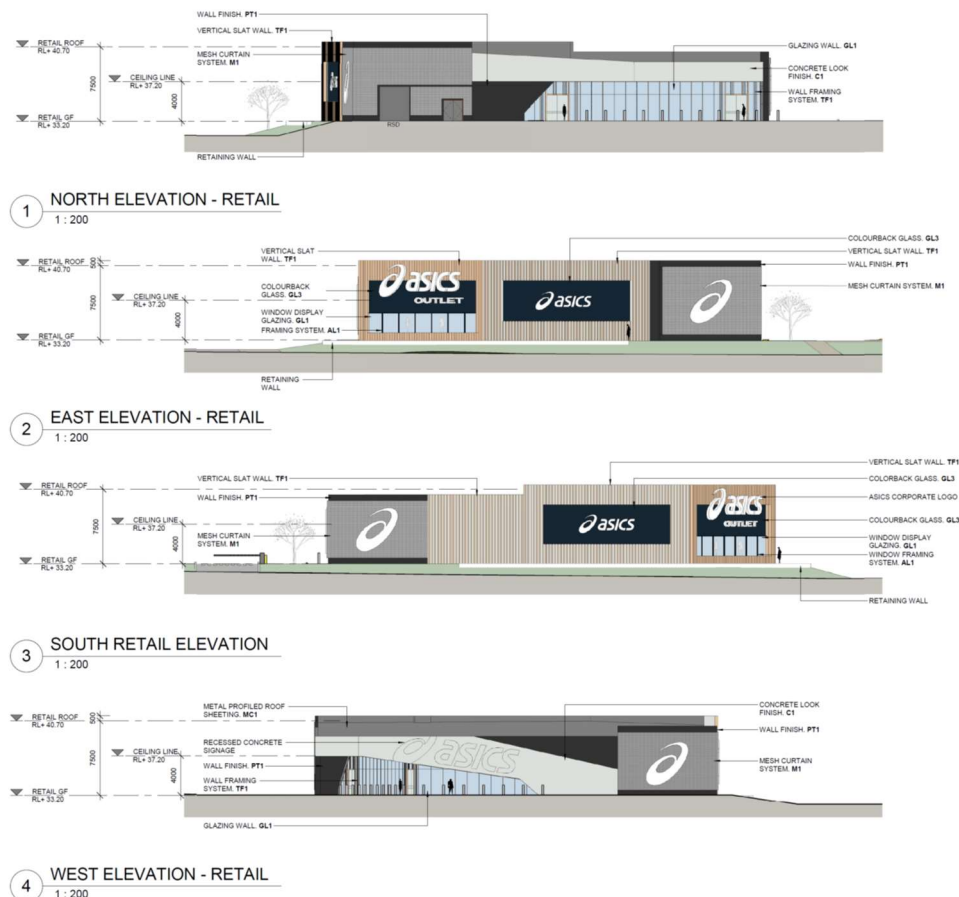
Representative Elevations – Showroom and Retail Outlet (Source: Reid Campbell)
